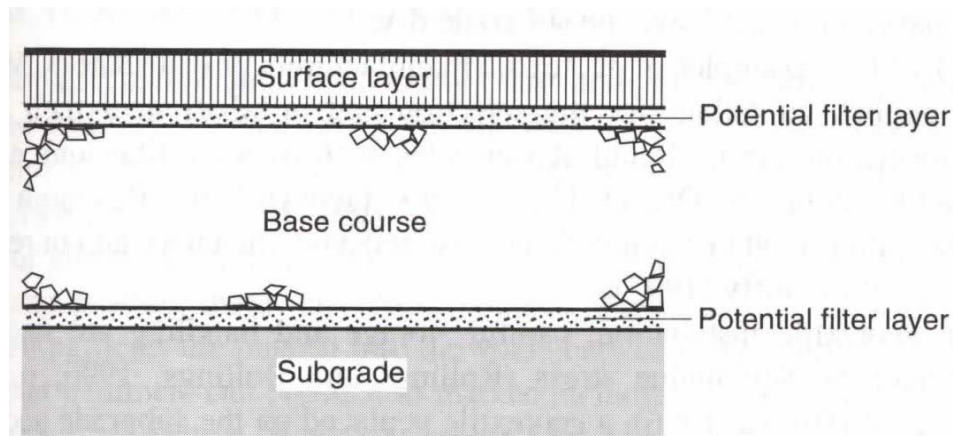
Typical Porous Pavement Cross-section (Ferguson, 2005). Pavements will generally have three main layers and geotextile filters.
